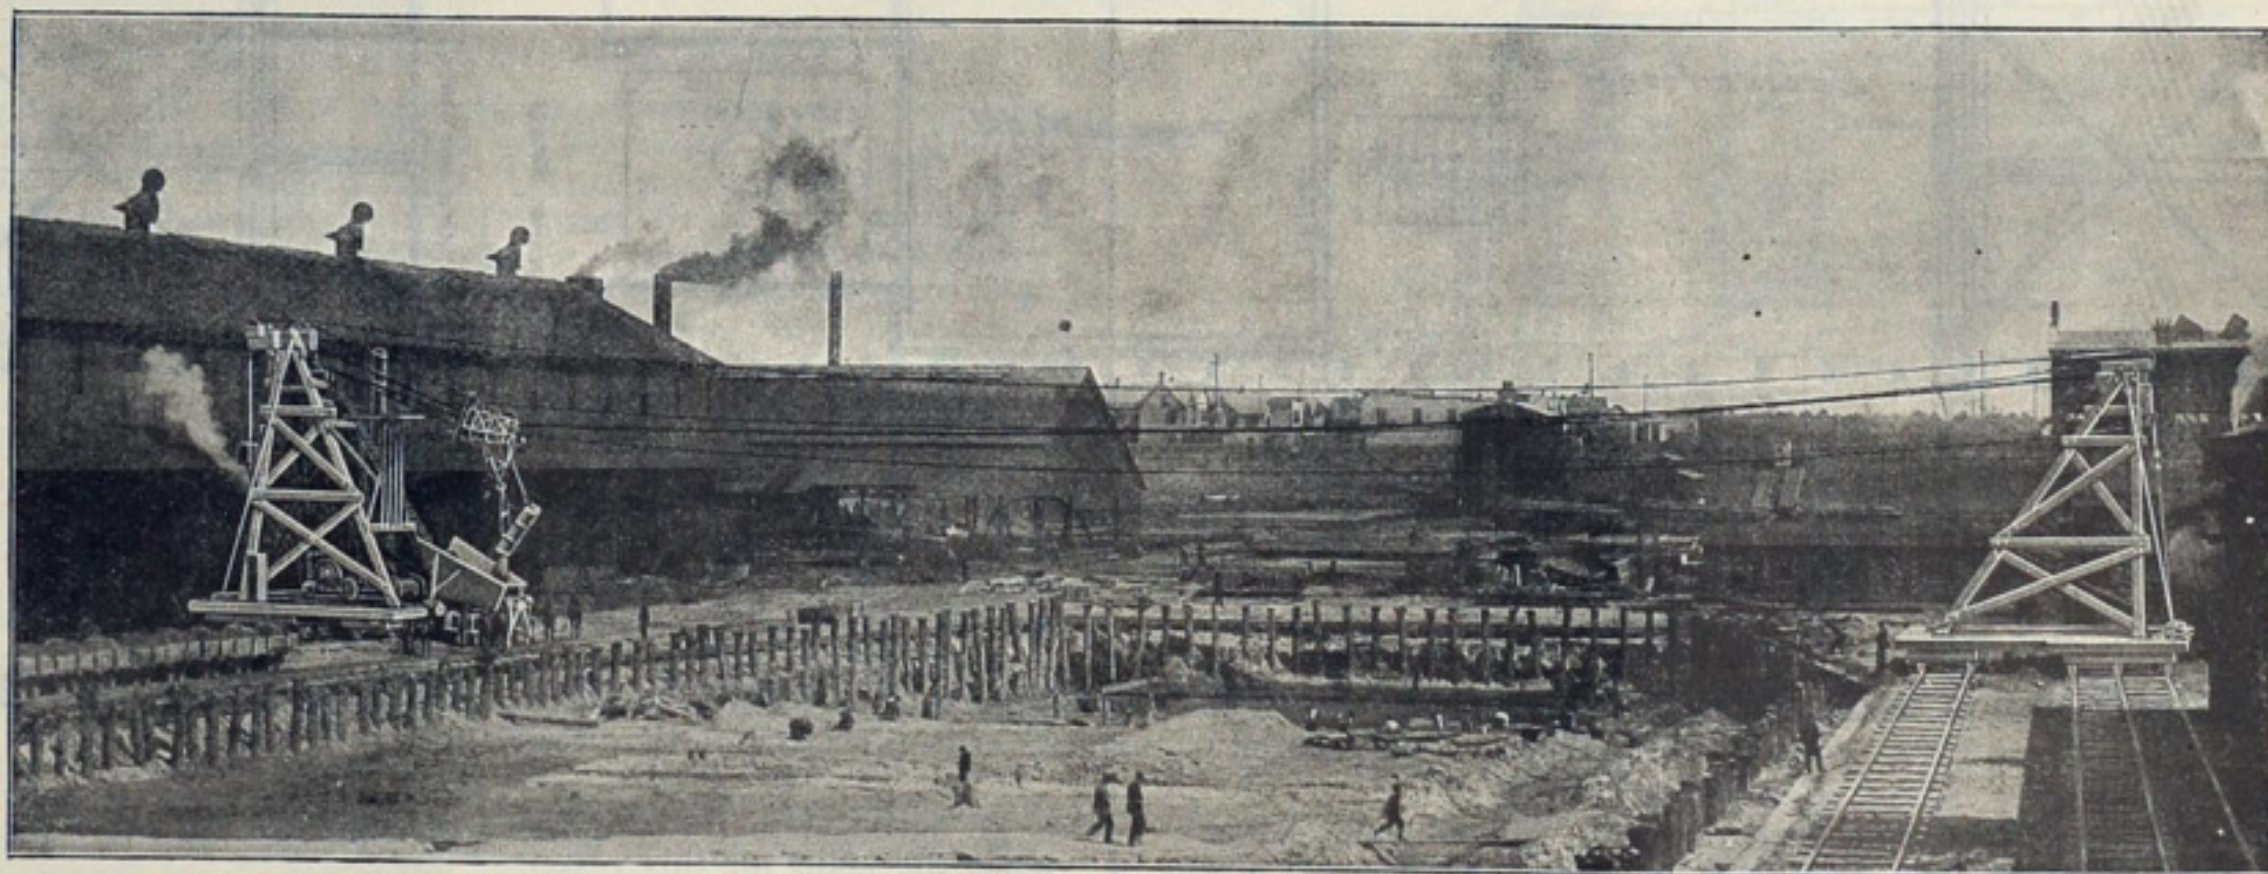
GENERAL VIEW, LIDGERWOOD CABLEWAY EXCAVATING DRY DOCK AT NEWPORT NEWS, VA.
